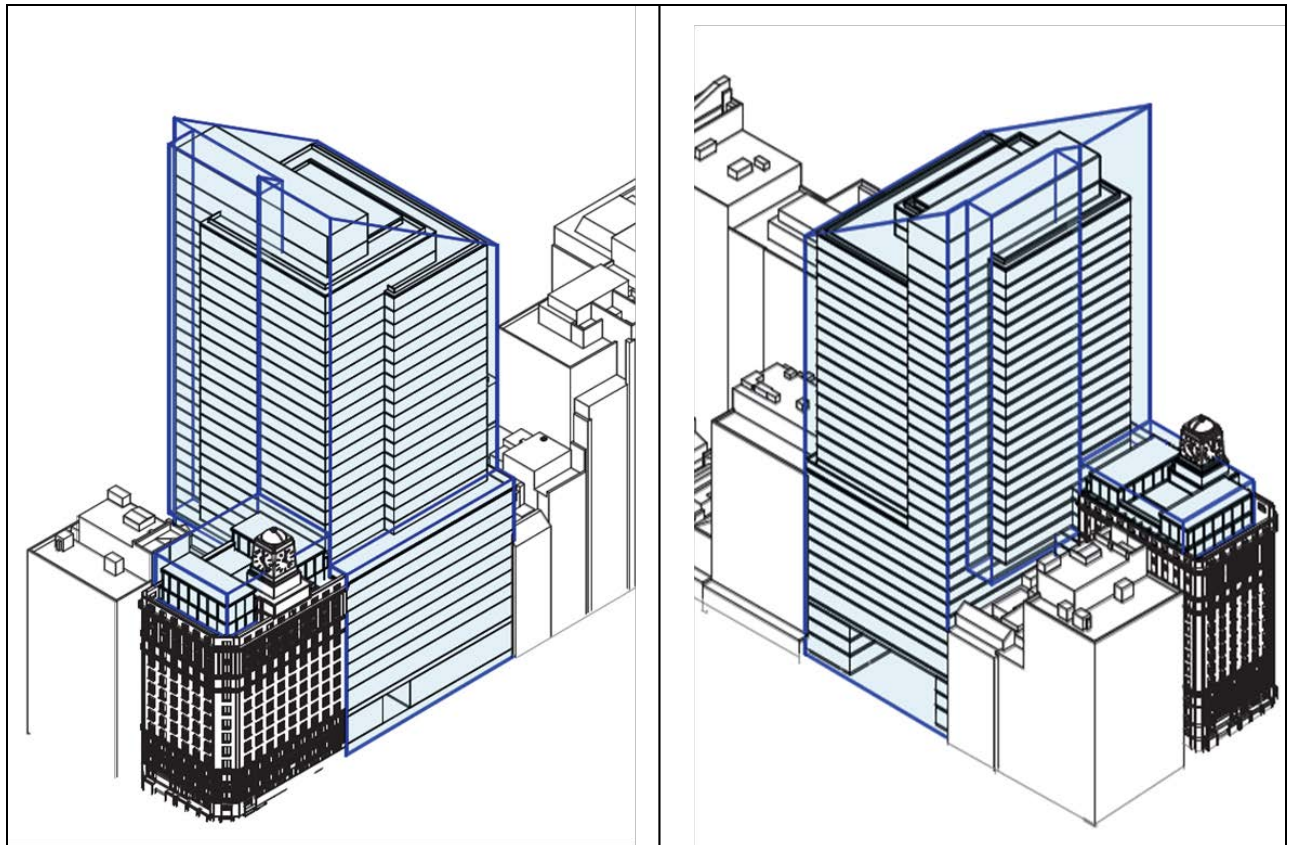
Proposed building is contained wholly within the building envelope, Carrington Street frontage (left) and George Street frontage (right) (Source applicant's EIS)
